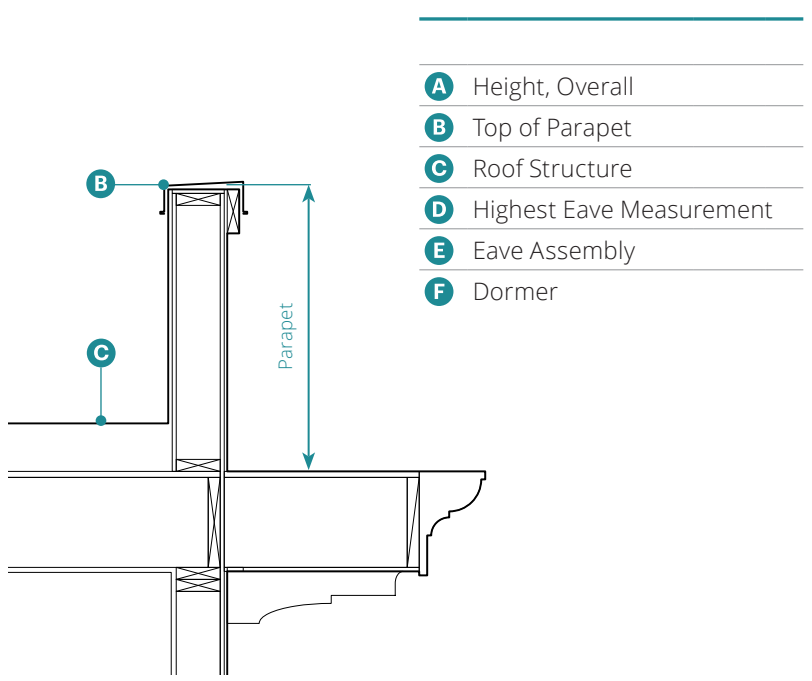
Subsection Detail of Top of Parapet and Flat Roof
